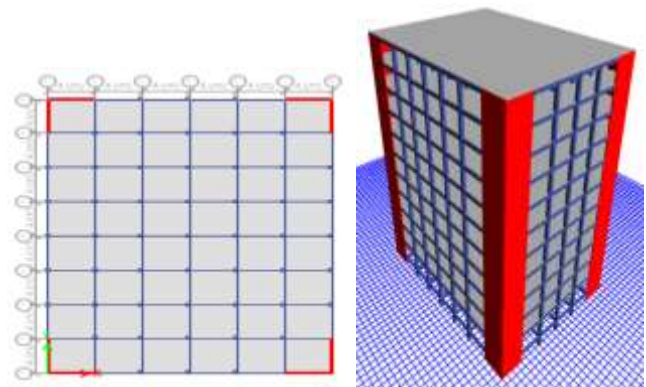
Plan elevation & 3D view for 0% slab opening with shear wall at corners.
